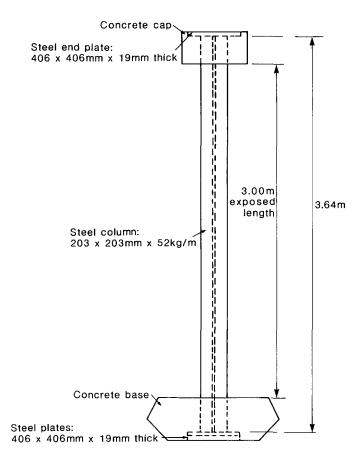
Vertical section of an unprotected column test assembly (UK)
